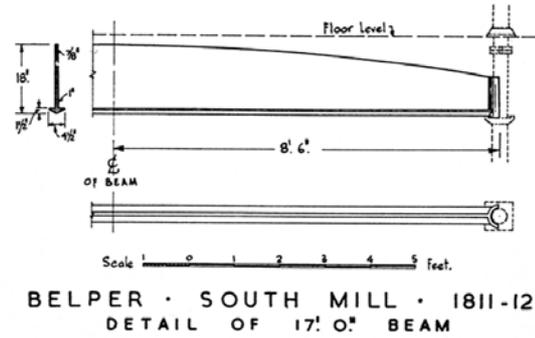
Detail of 17' cast iron beam of South Mill at Belper, Strutt, 1812. (Johnson and Skempton)
